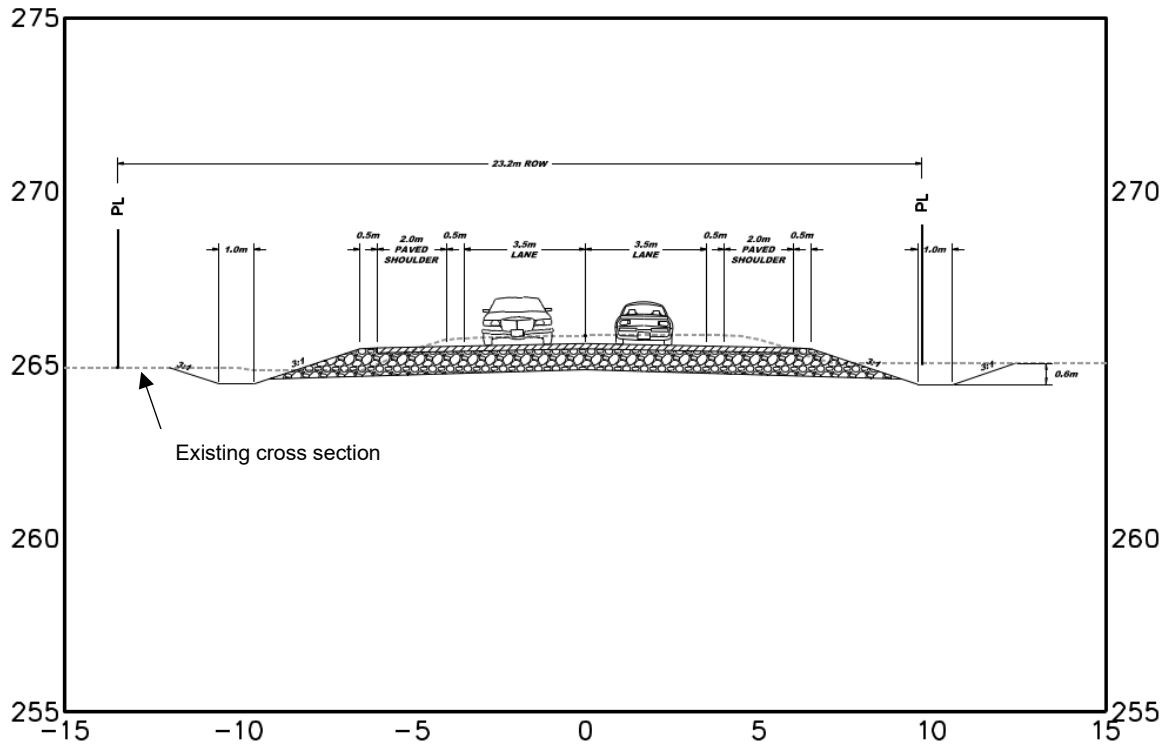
Proposed Cross Section – Outside of Wetland Area
